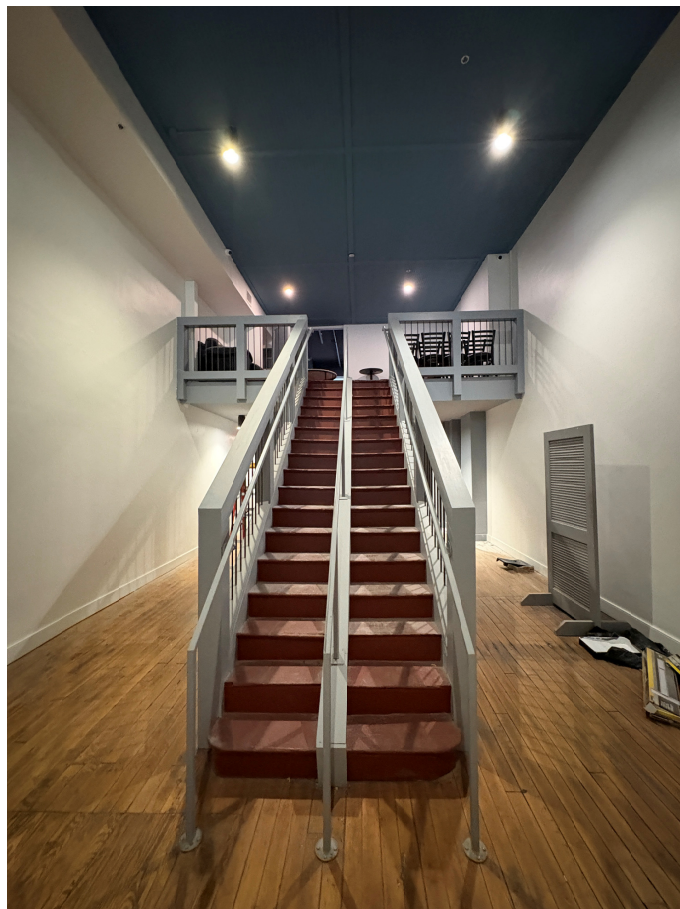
Interior 5 side floor 1-mezzanine looking at mezzanine stair.
